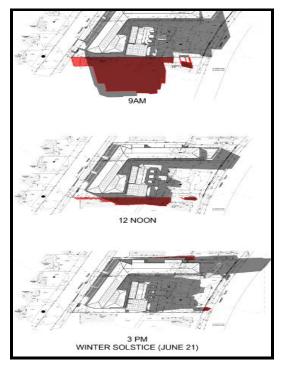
Shadow Plan - Midwinter (Source: Innovate, October 2020)
